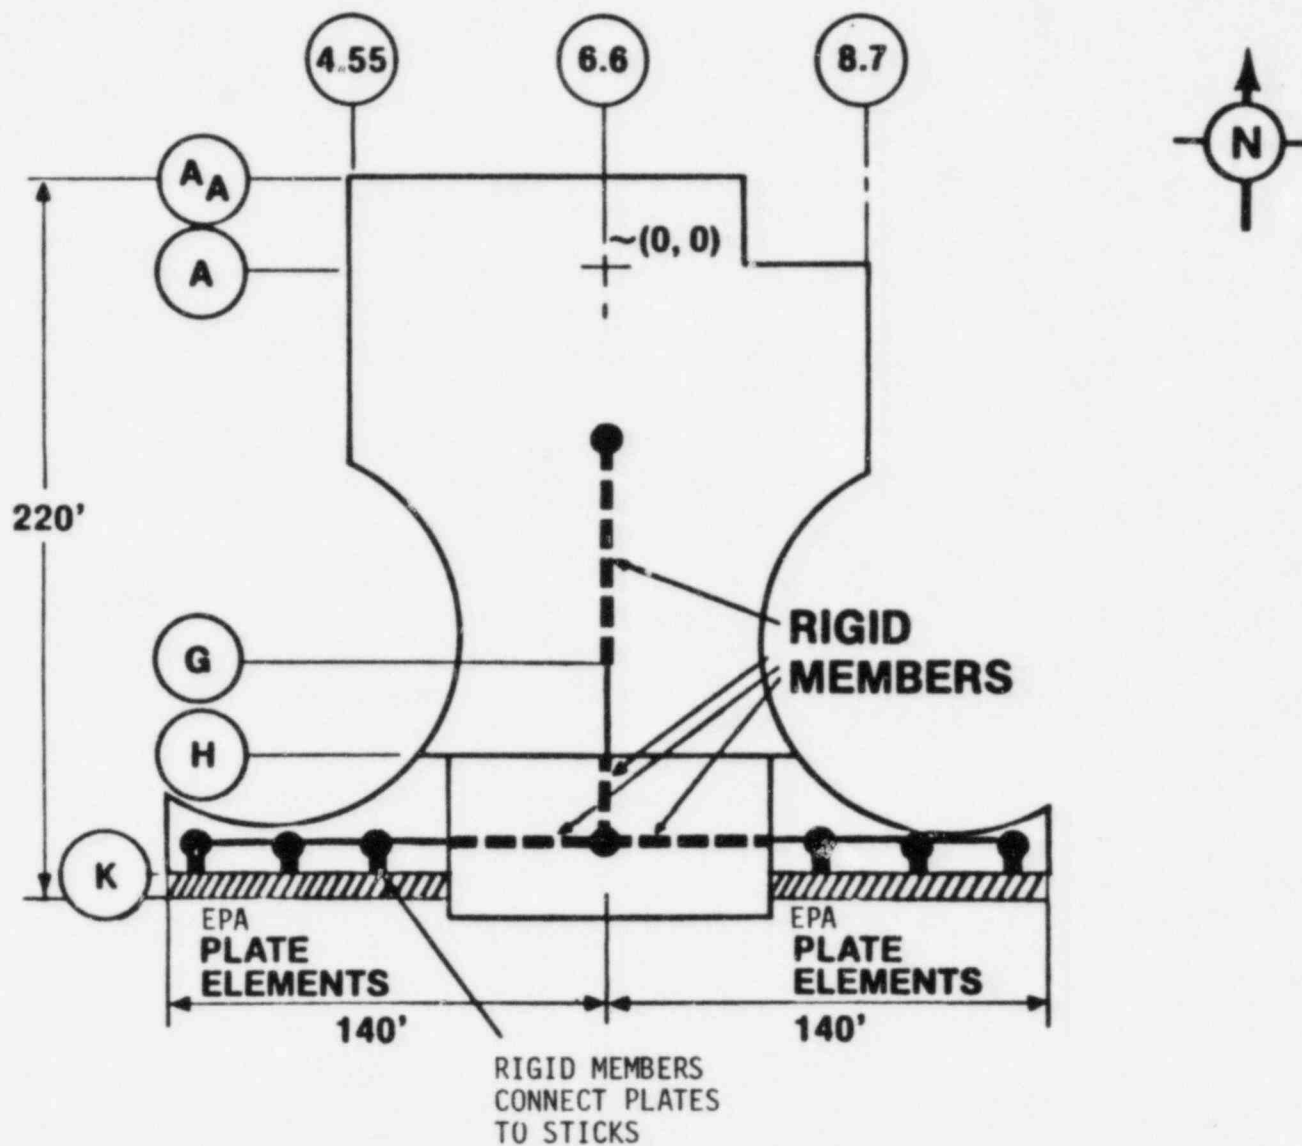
PLAN VIEW OF AUXILIARY BUILDING, SHOWING LOCATION OF VERTICAL BEAMS MODELING MAJOR STRUCTURAL ELEMENTS
